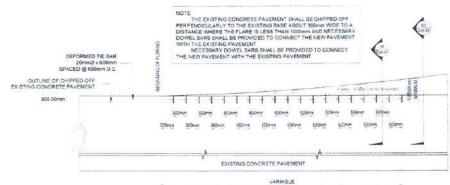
DETAILS OF BAR SPACING ALONG CURVES NOT TO SCALE
